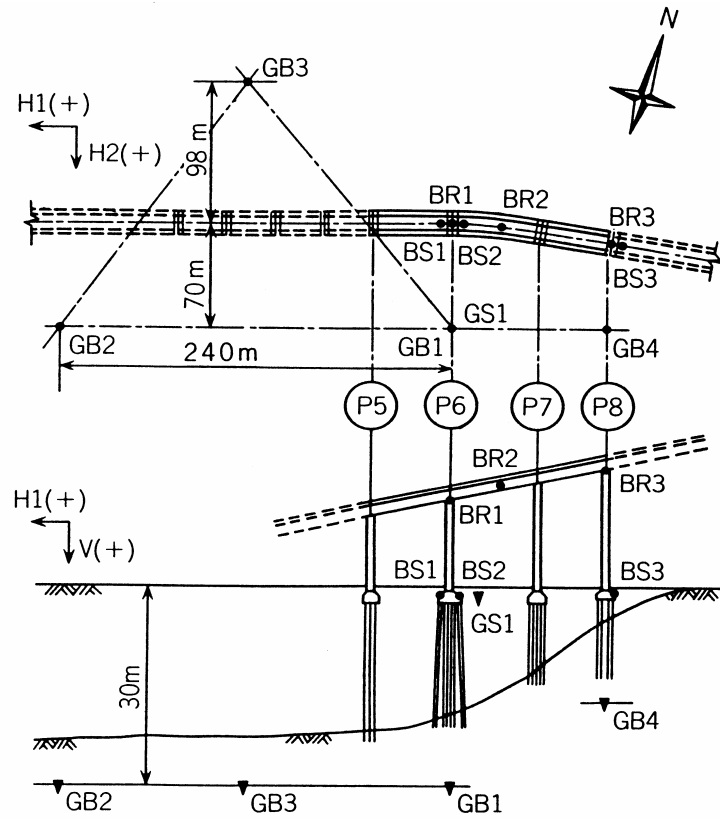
Plan and Elevation View of the Considered Bridge Section and Installation of Accelerometers [after Ohira et al. (1984)].
